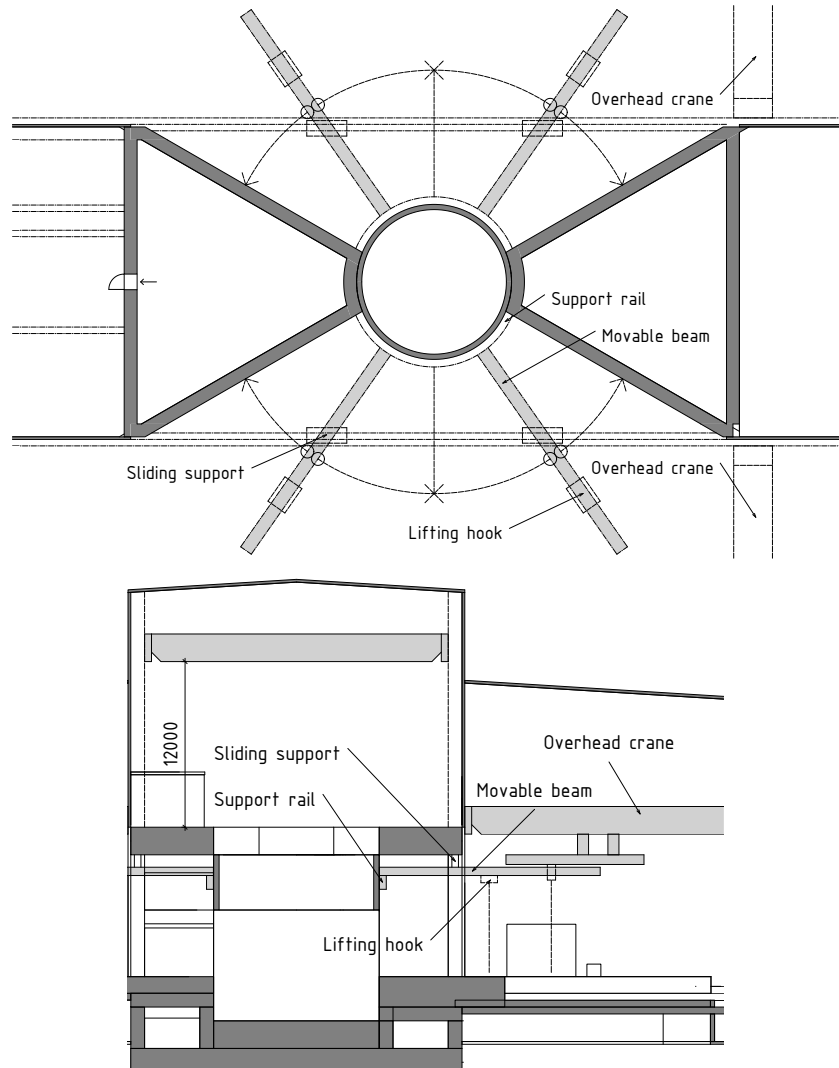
Preliminary layout for the target monolith crane. Top: Plan view. Bottom: End view.
